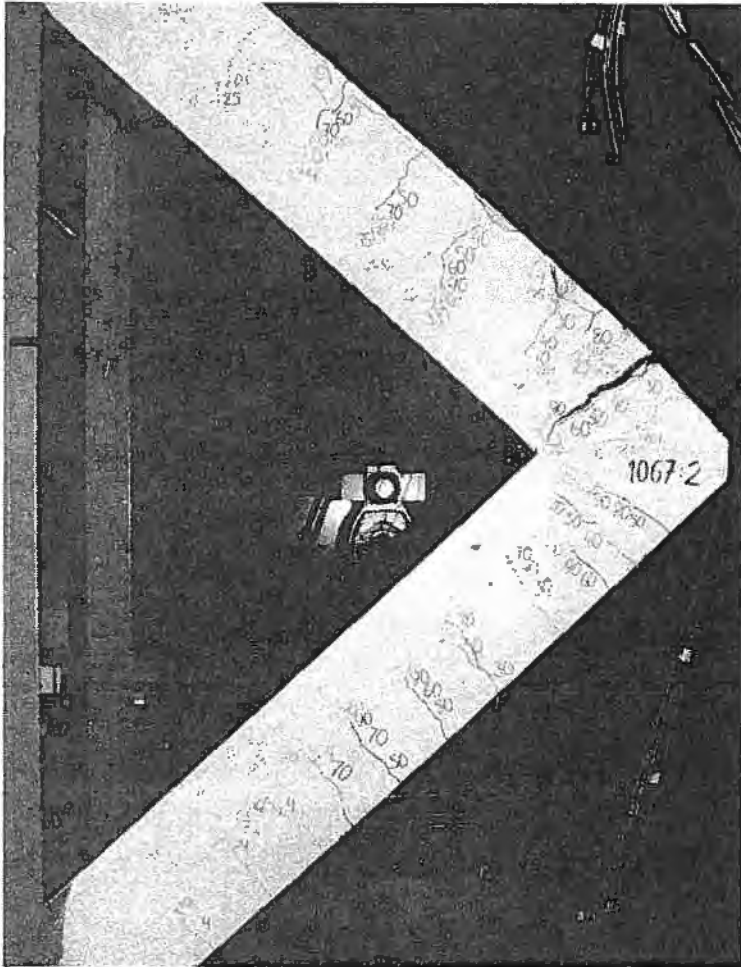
Fatigue failure in a spliced frame corner
